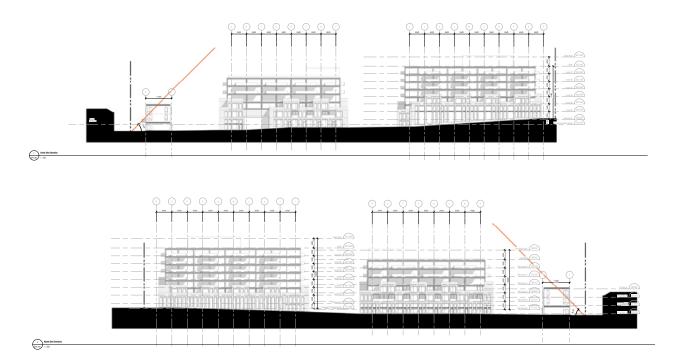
South and North Site Elevation, illustrating Angular Plane objectives and site grading
